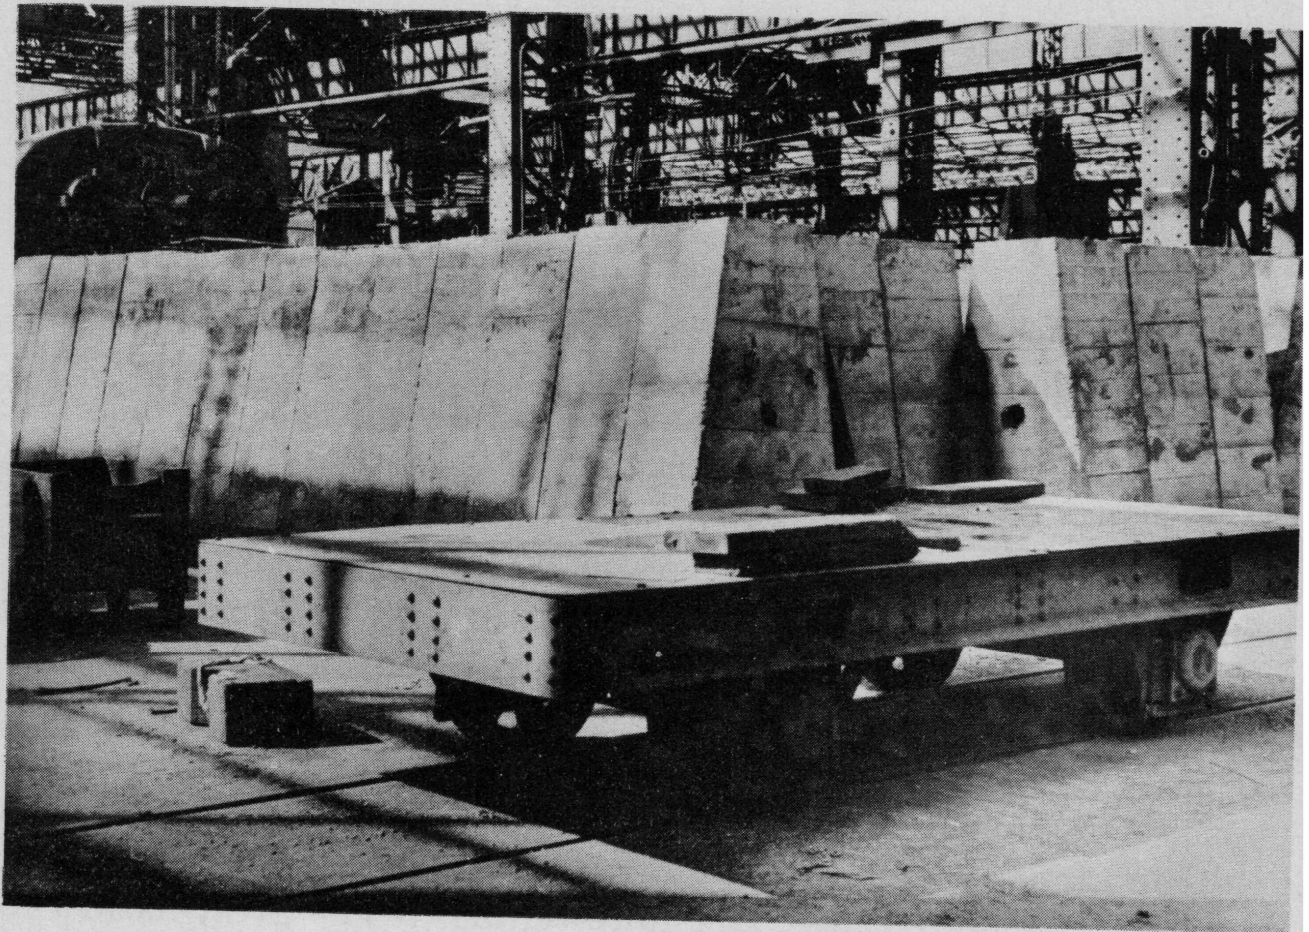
Precast, reinforced-concrete blast walls (0.85 mile from ground zero at Nagasaki).
